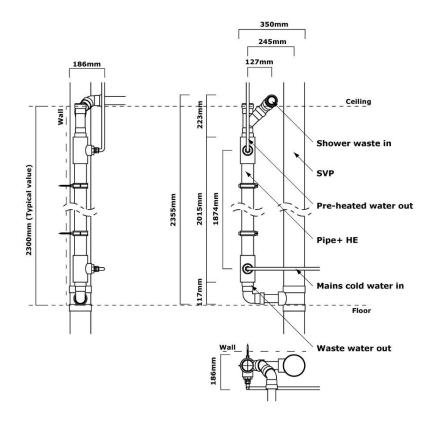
b. Dimensions & Connections with horizontal shower waste
